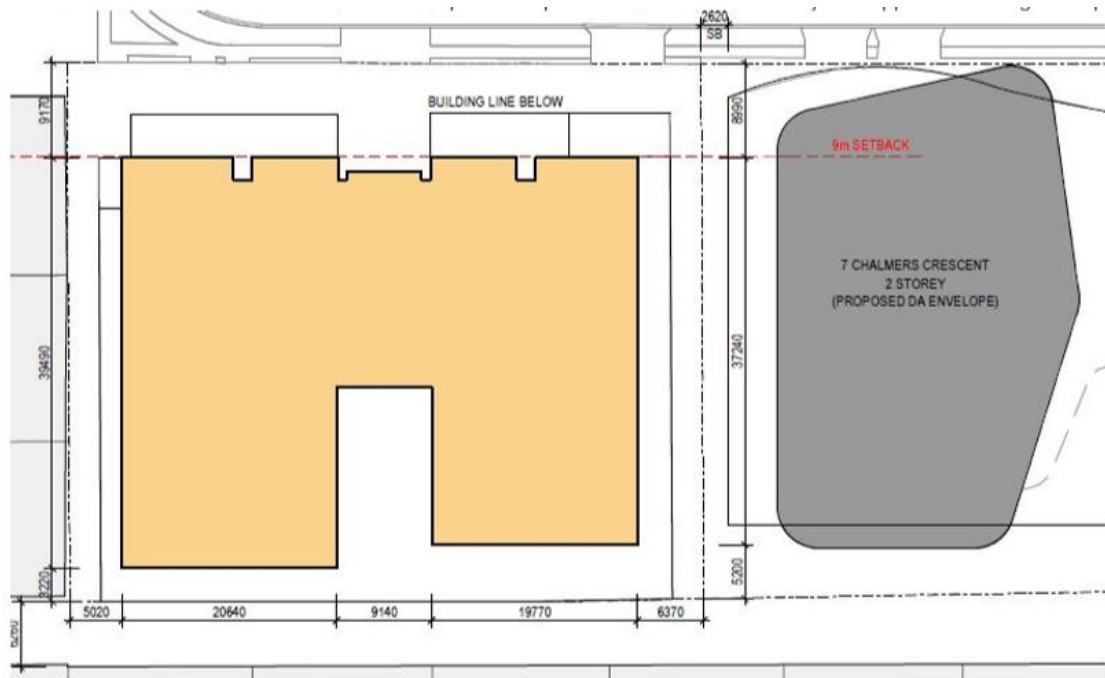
Comparison of ground level setbacks with adjacent approved building envelope
